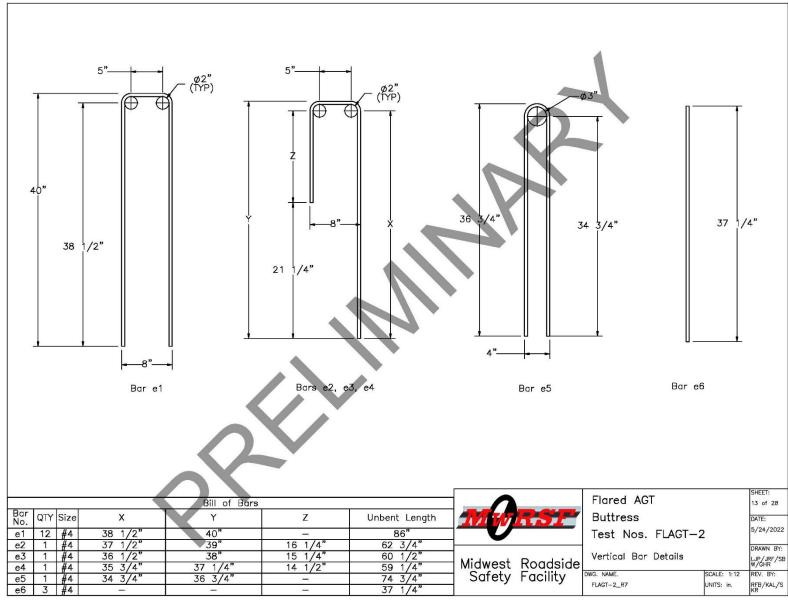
Vertical Rebar Details, Test No. FLAGT-2
